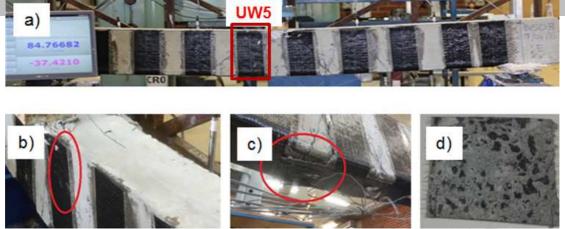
(a) Failure mode of Beam B150B; (b) U-jacket debonding; (c) Rupture of the soffit strip; (d) BFRP/Concrete interfacial failure of U-jacket UW5
